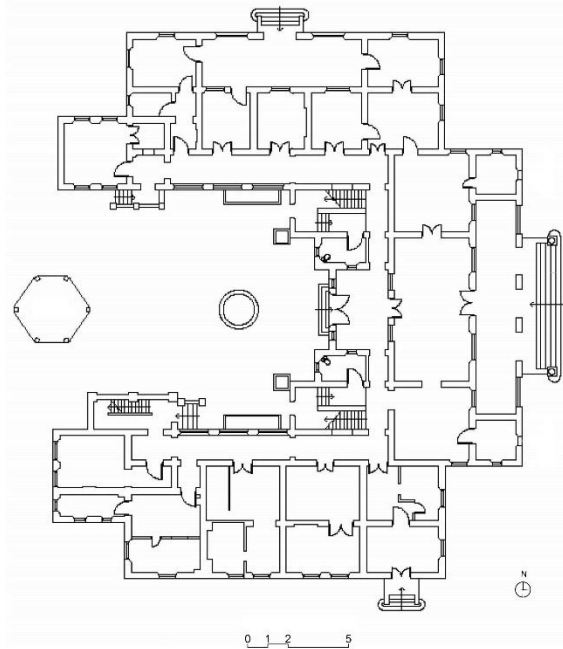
Ground floor plan of the German *Boma* in Bagamoyo
